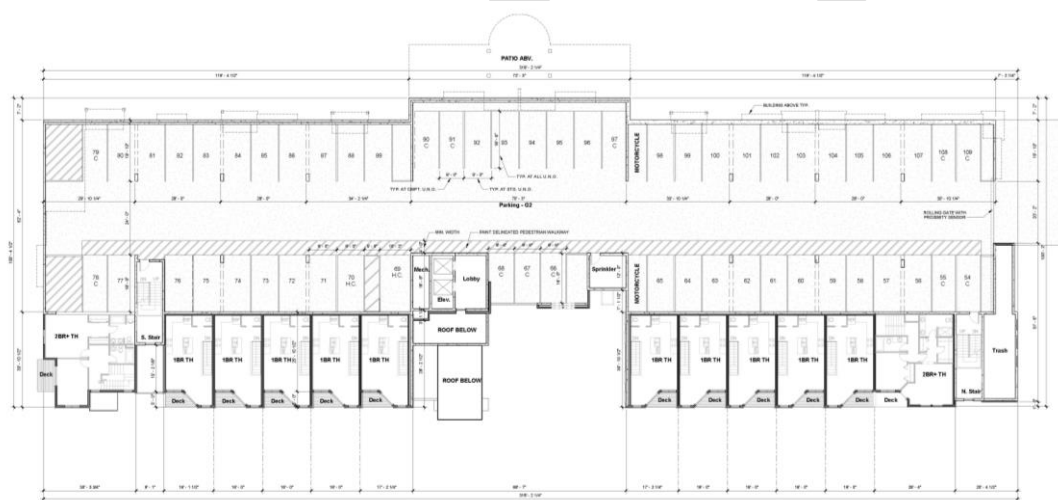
Building 1 Second Floor Parking (Source: Inneswood Plan Set)
